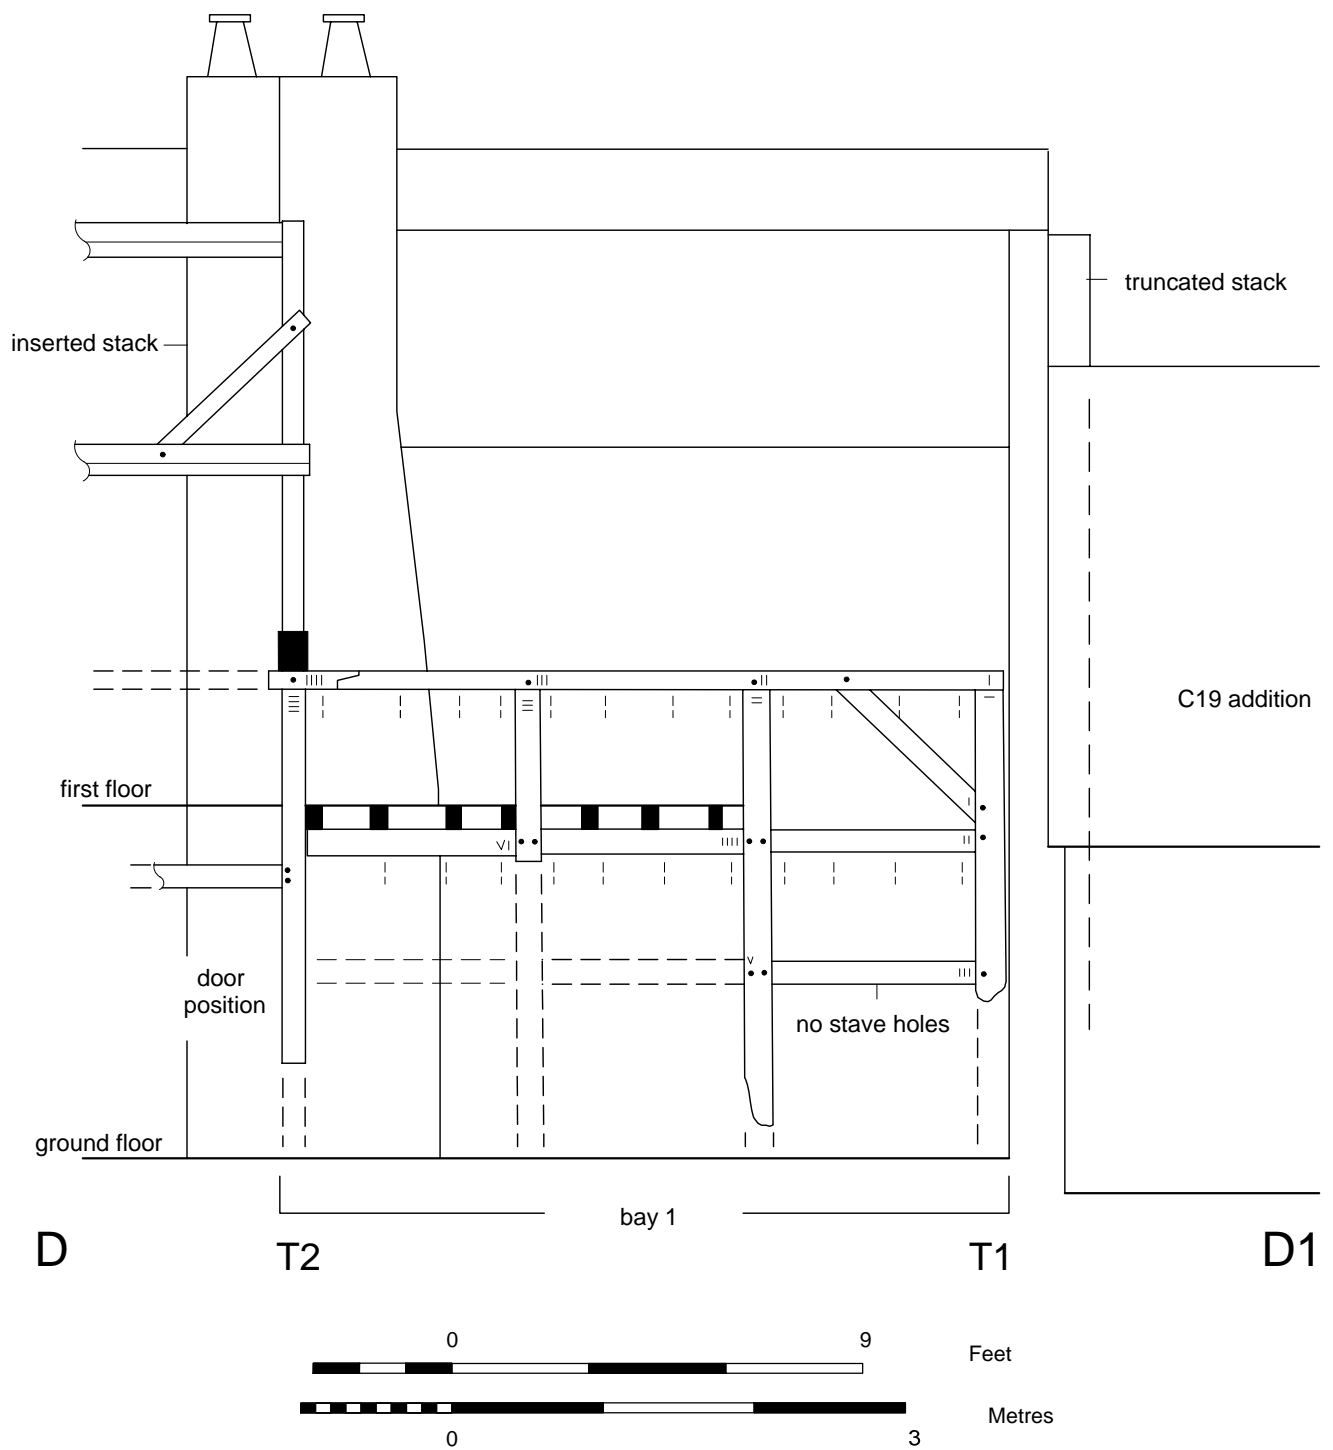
The Old Cottage, Main Street, Cotesbach. Rear Elevation Detail of Bay 1 Framing D - D1.
